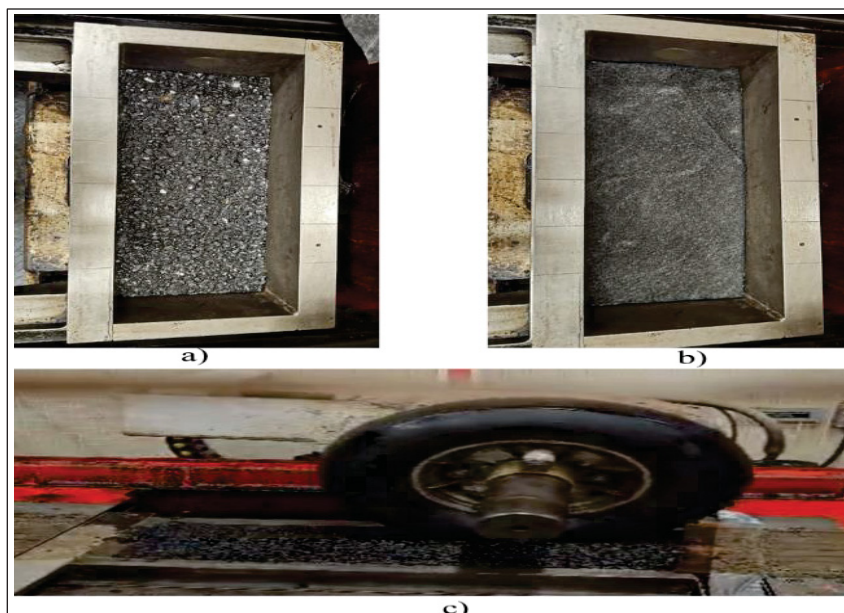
Specimen fabrication process using the French roller compactor: (a) compacted bottom asphalt layer in the steel mold, (b) paving fabric interlayer installed over the cured bottom layer, and (c) French roller compactor applying compaction to the top asphalt overlay
